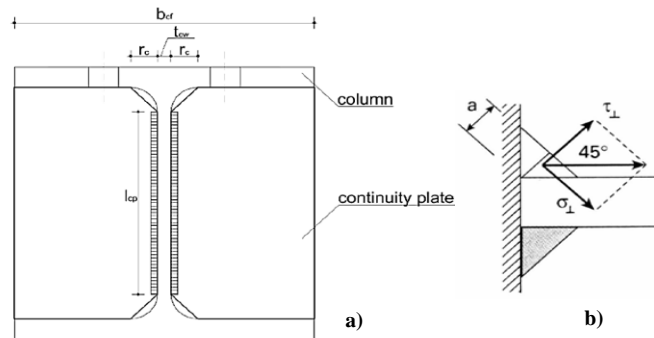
Geometry of the continuity plates welds: a) Length of the welds; b) thickness of the welds.
